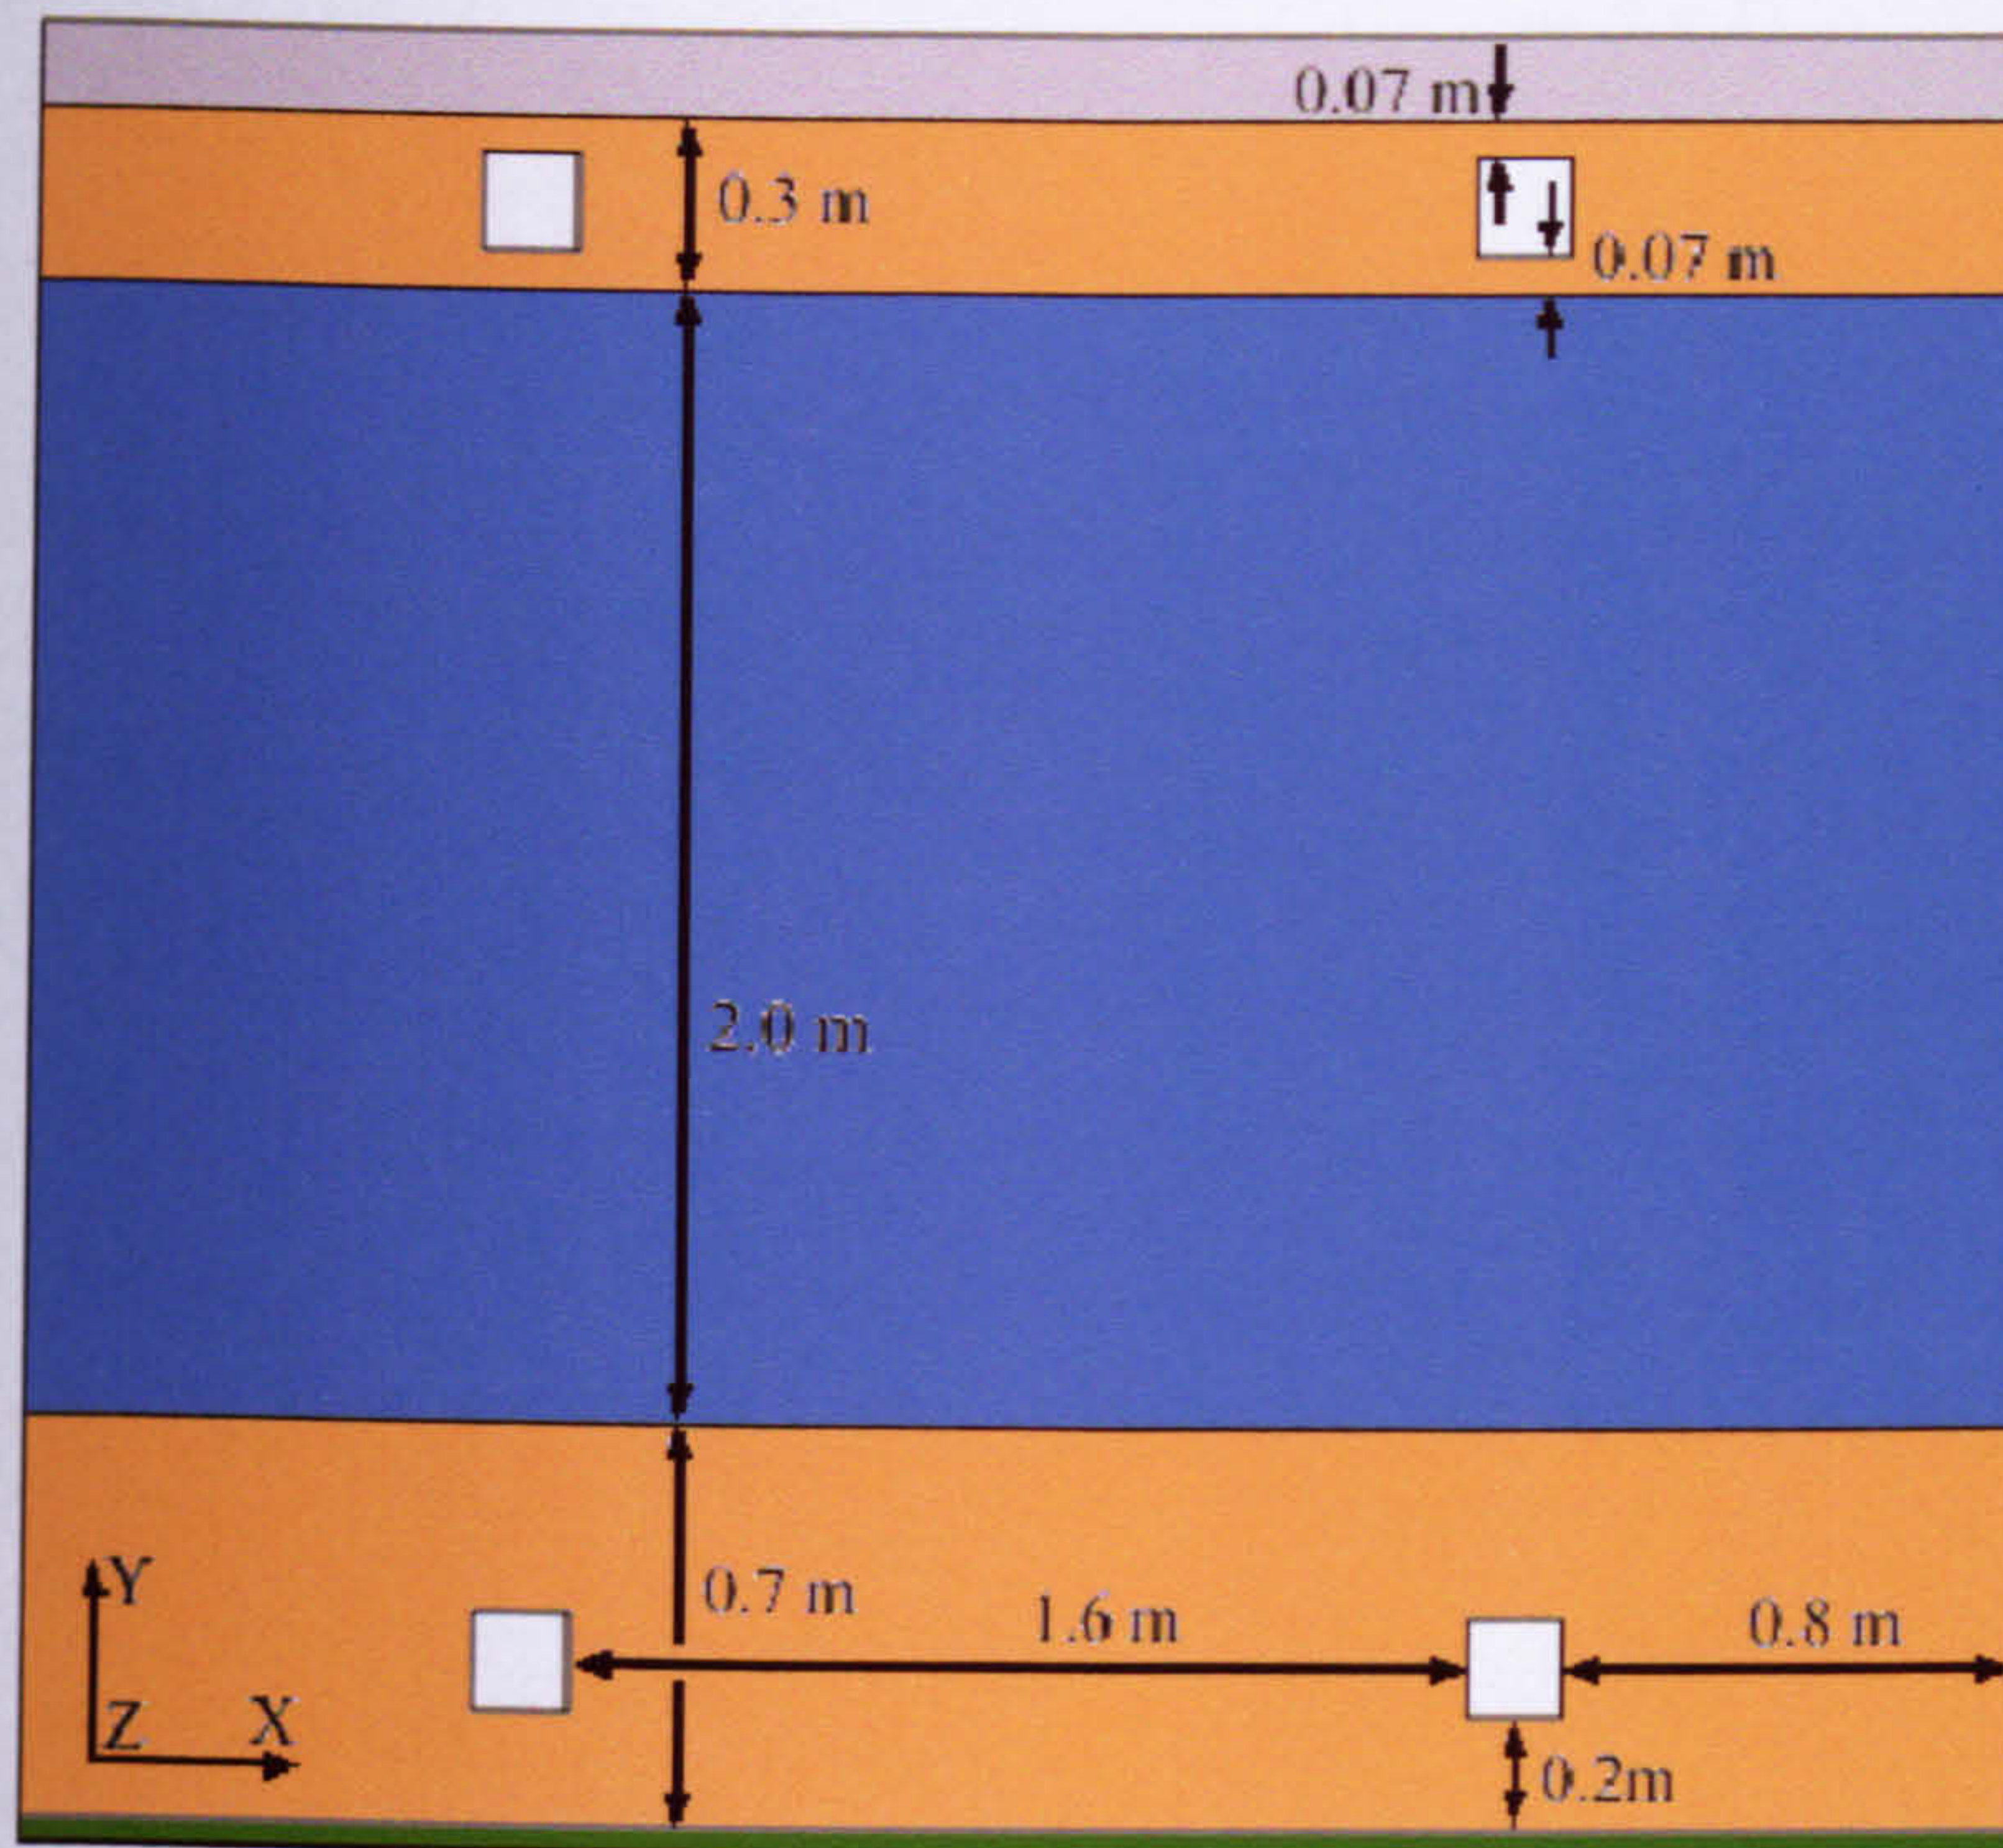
Positions of the openings (white shaded) for benchmark 3; concrete ceiling (grey shaded), external concrete wall (orange shaded), screed (green shaded) and window (blue shaded).
